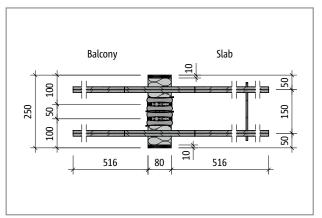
Schöck Isokorb® T type Q-E-VV5: Product layout; lateral fire protection boards
